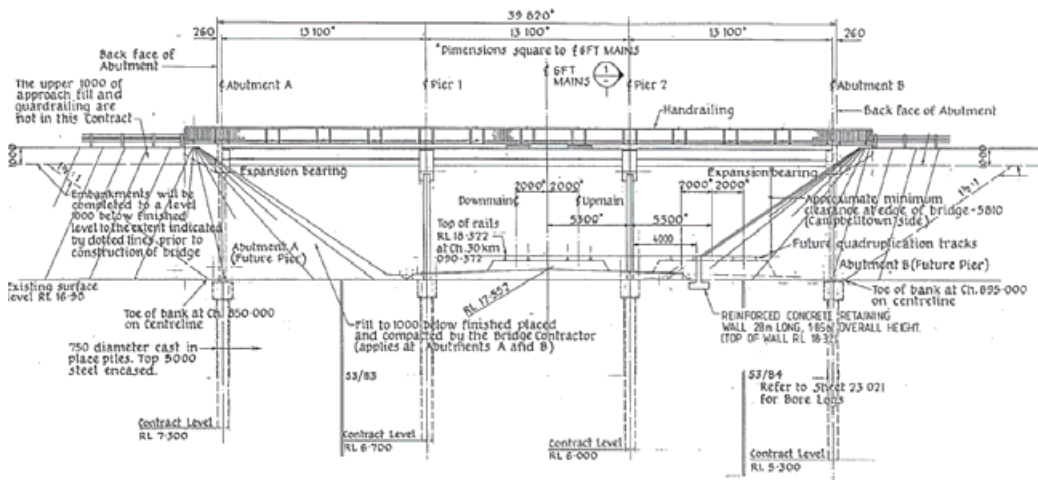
Moorebank Avenue Overbridge – Existing Configuration
